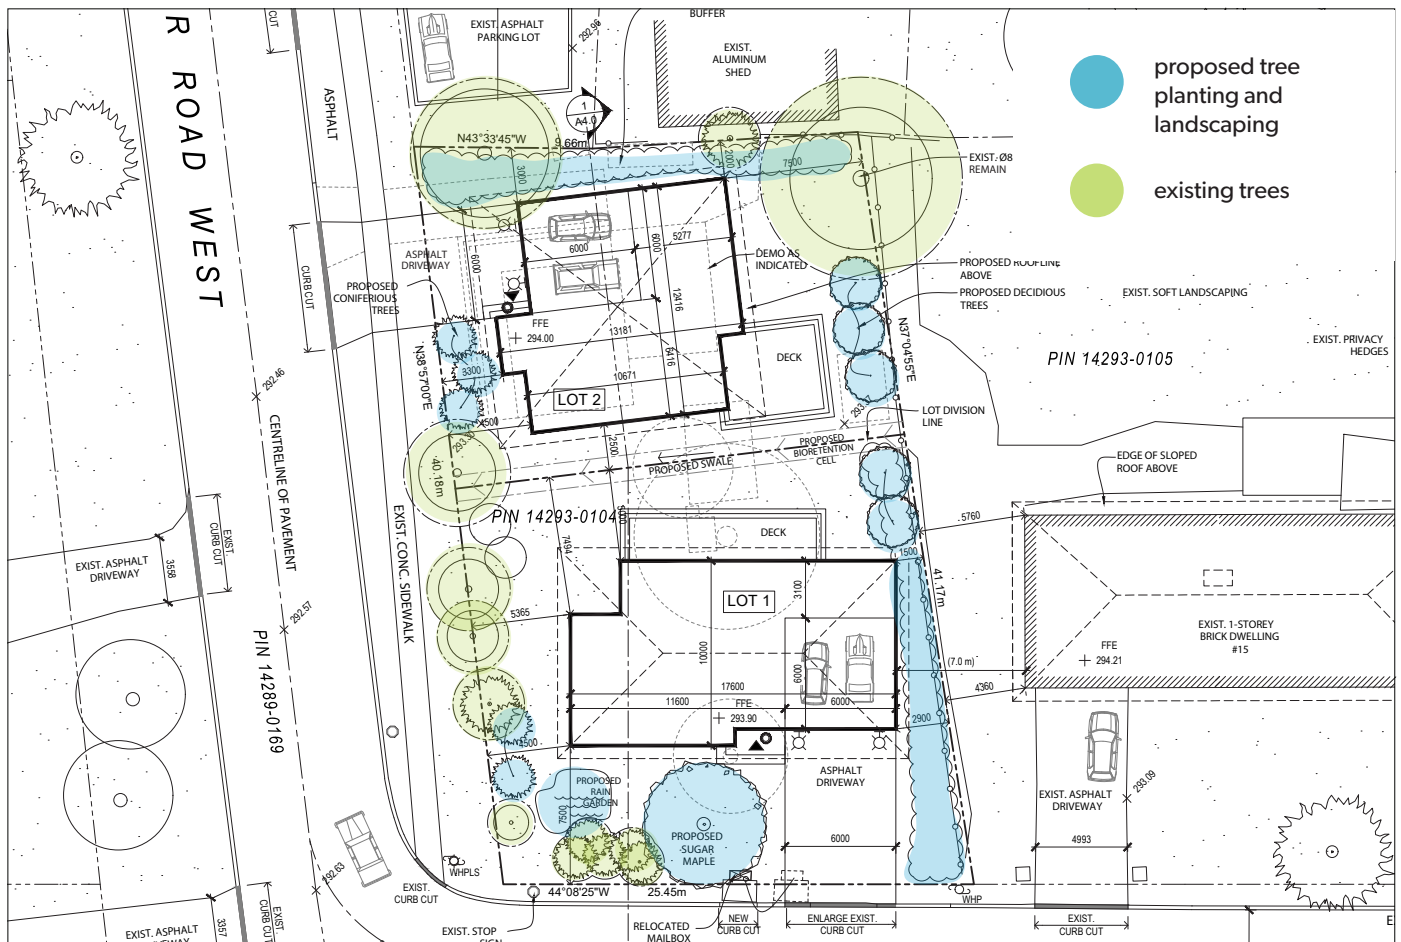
Site Plan of the Proposed Development Indicating Retained and New Planting; V&A Architects, 2019.07.26
